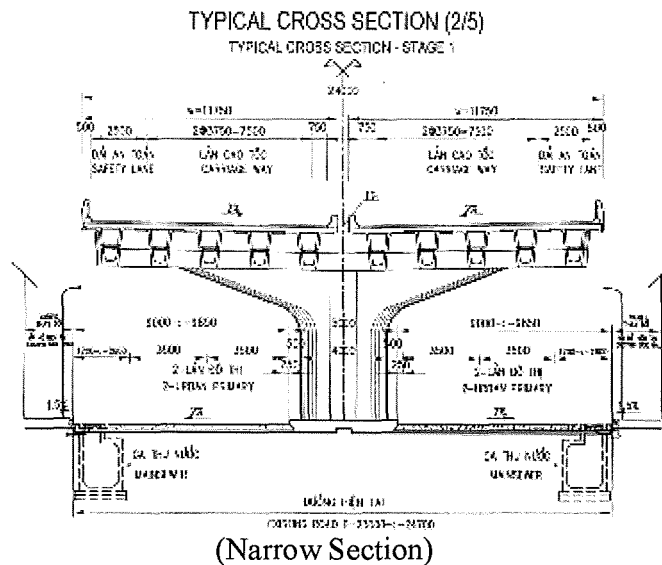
Typical cross-section of the urban road and expressway
